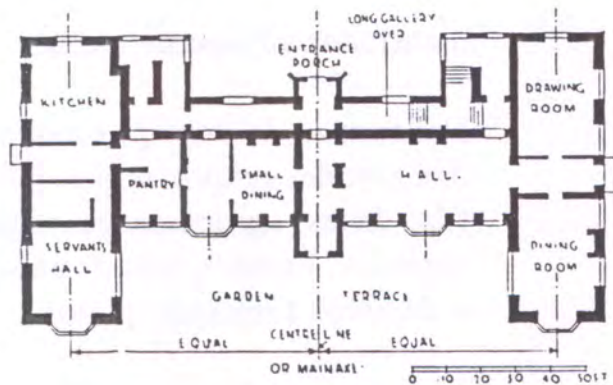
HADDON HALL, DERBYSHIRE. Ground floor plan.
